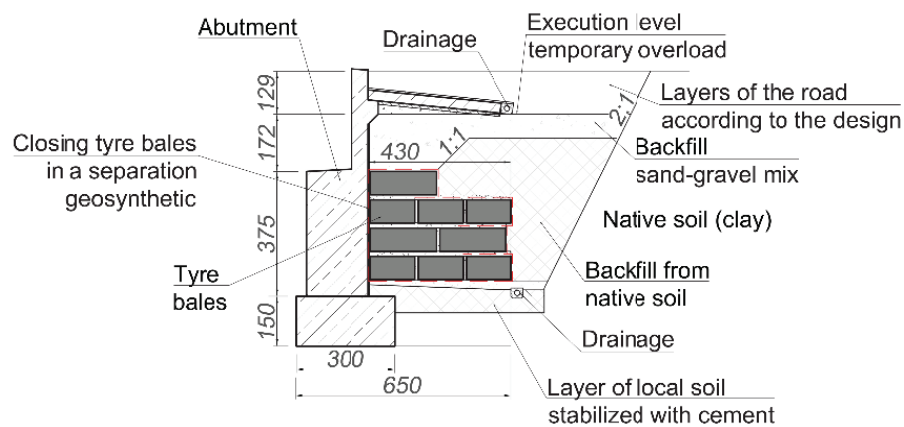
The abutment backfill of Sielnica bridge, Poland: layers of tyre bales
